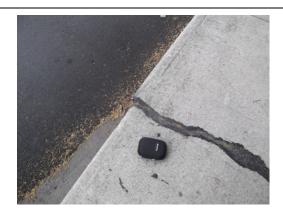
15mm offset in footpath due to movement of the cantilevered road section.
